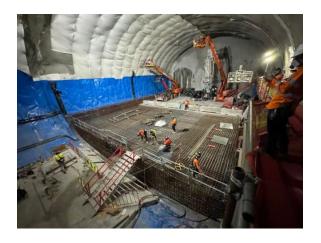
Westmead Site: Steel reinforcement placement for the Crossover Cavern Invert Slab.
